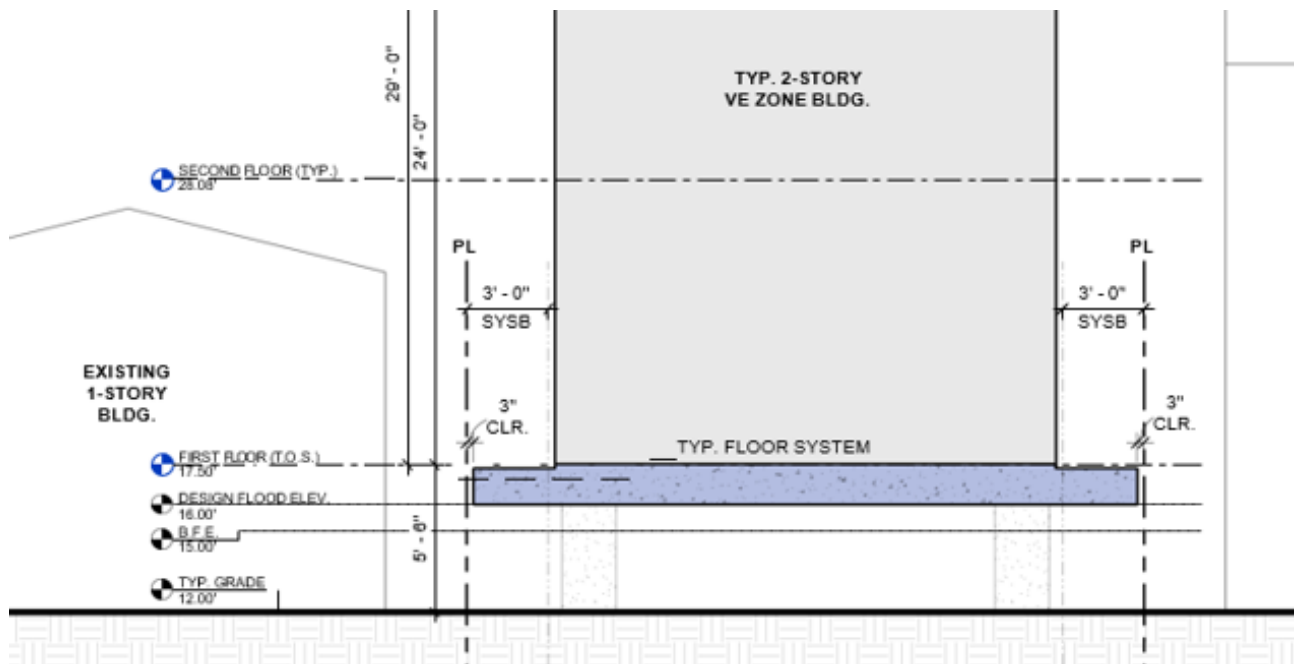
Section of Side Yard Encroachments with Proposed Amendments
